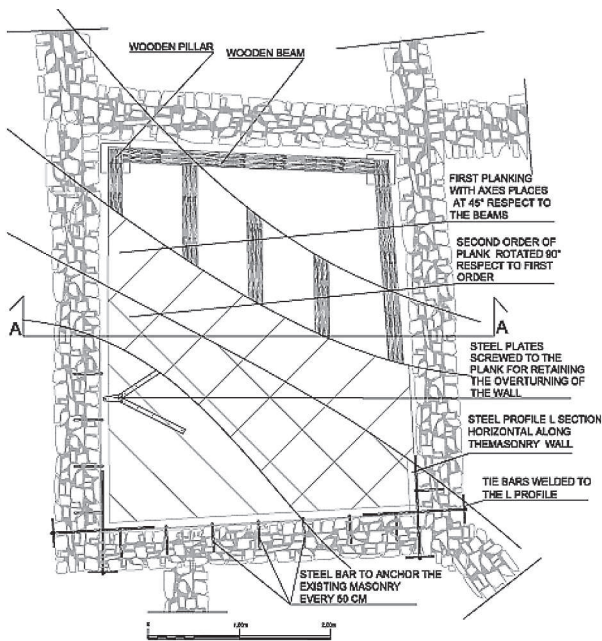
A typical floor plan view with the double layer of crossed planks and the connections between frames and masonry
